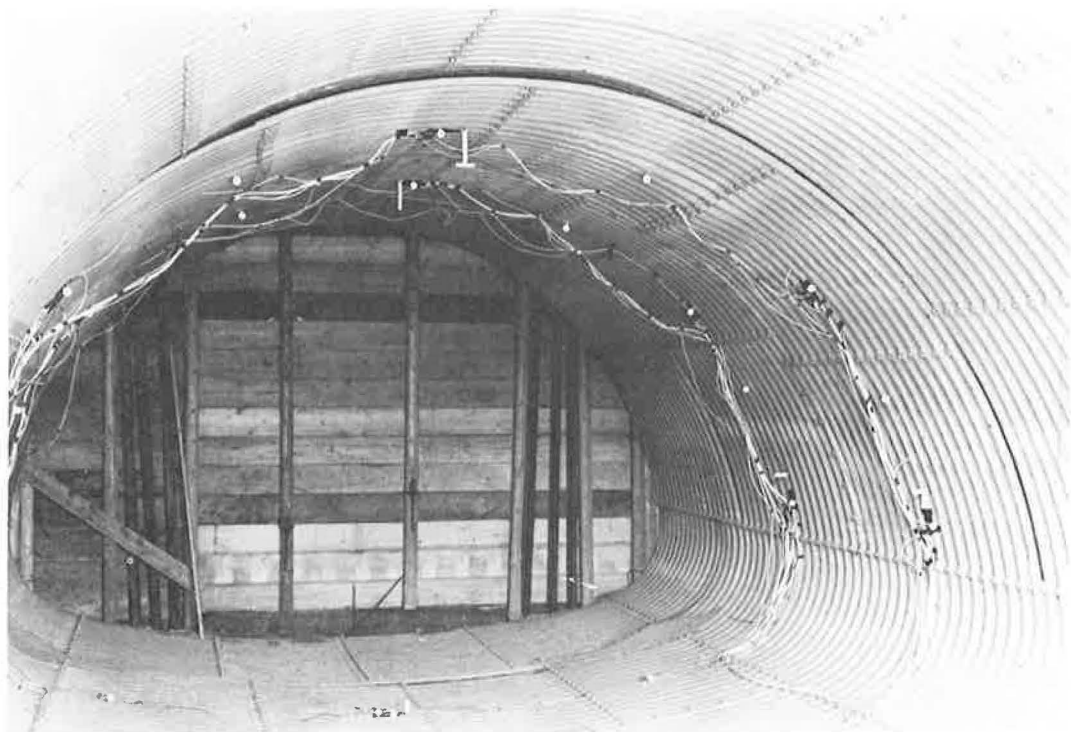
Inside of pipe arch with bulge-shaped deformations on either side of crest. Center section of structure clearly deflected against adjacent rings.
